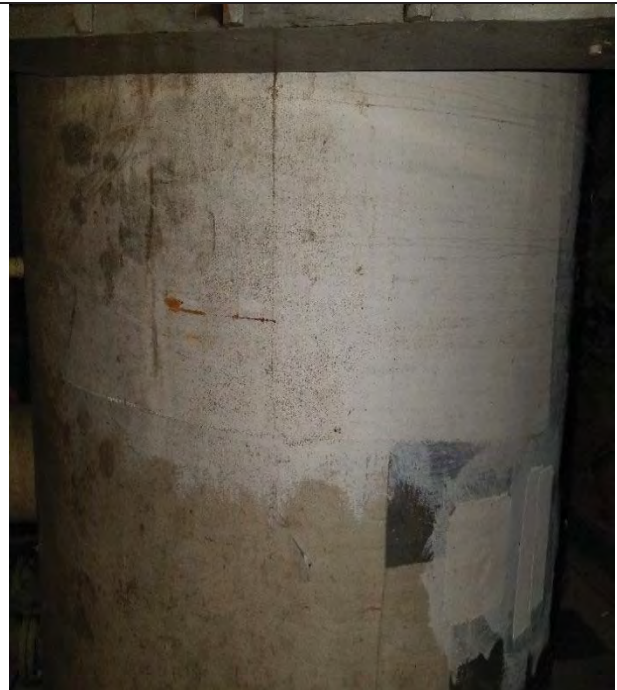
Parged pipe wrapping located in the Sewage Room 120A. Presumed asbestos containing.
